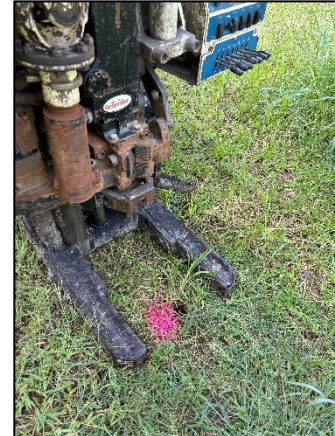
Viewing 8121 SB01 Drilling, Facing West.
